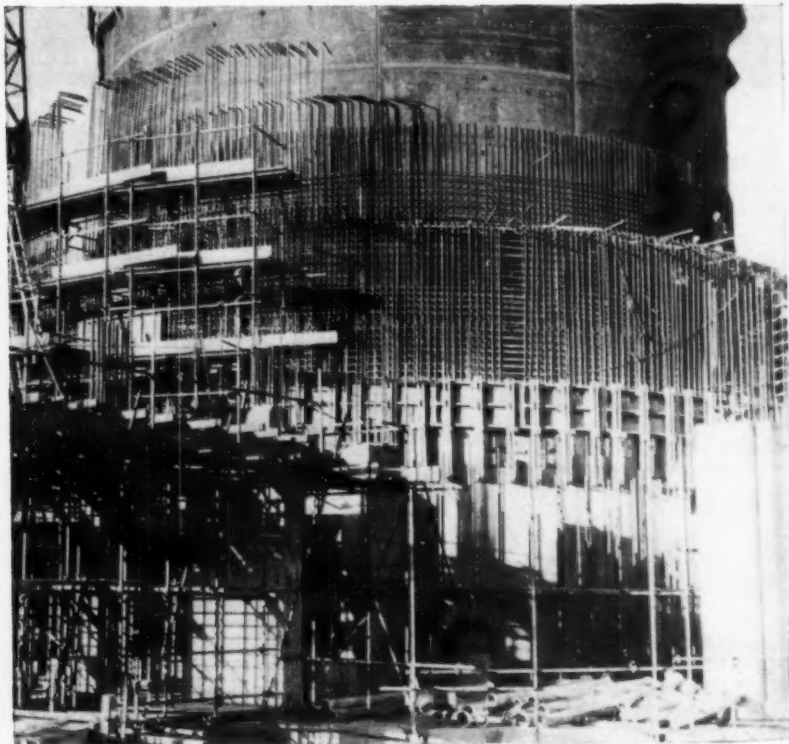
Shuttering and Reinforcement of Shield Wall.
